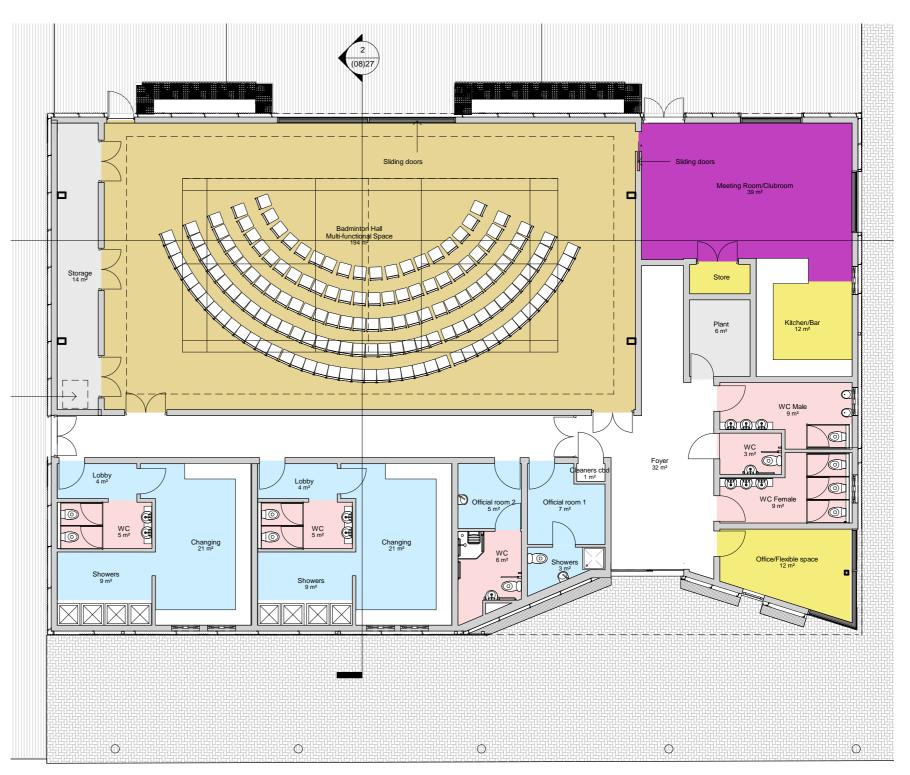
Ground Floor Plan as proposed showing general arrangement of accommodation (not to scale)
